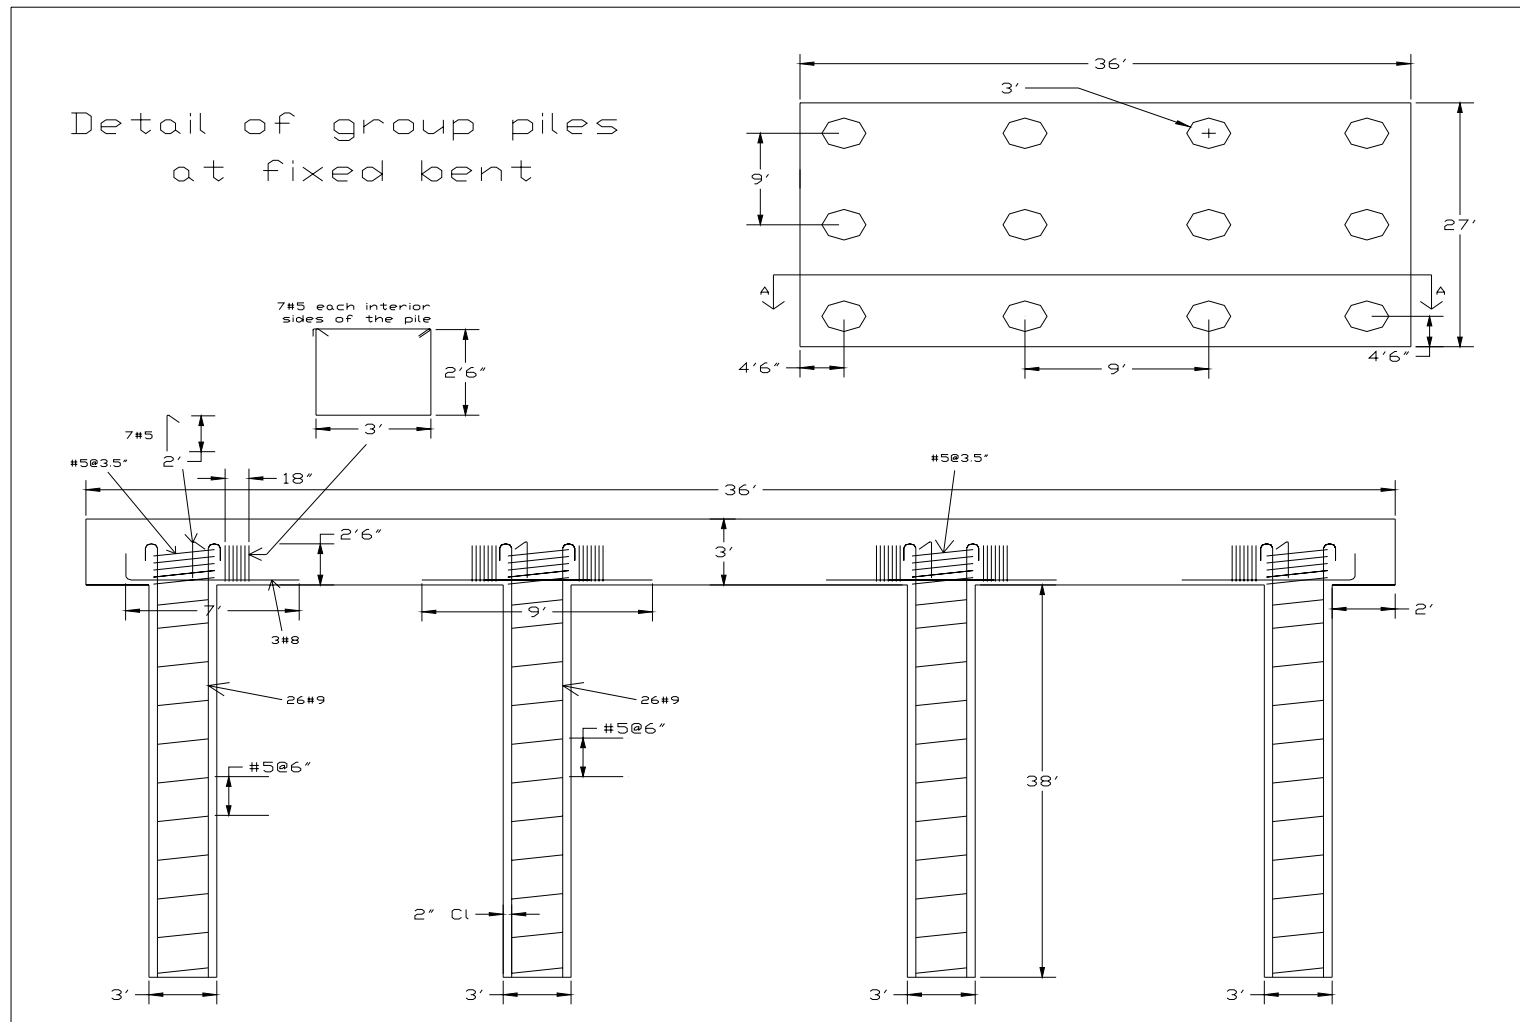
NCHRP Foundation Design Details for Fixed Bent
